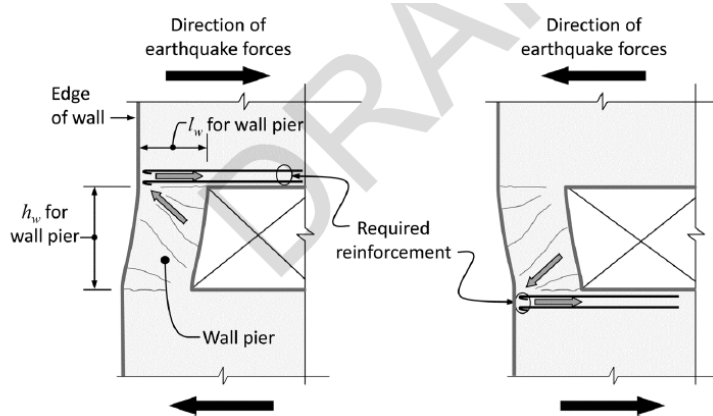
Required horizontal reinforcement in wall segments above and below wall piers at the edge of a wall.
